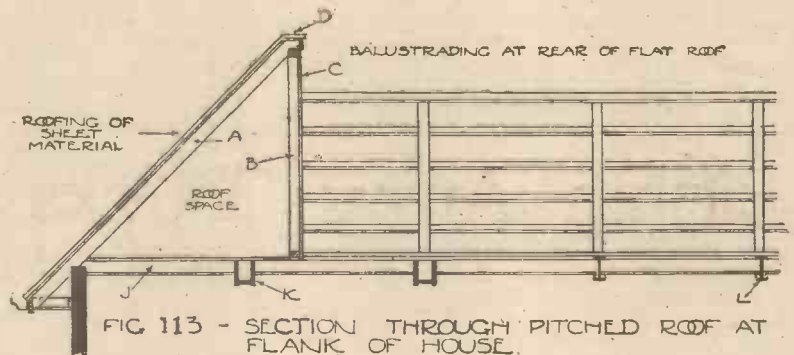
SECTION THROUGH PITCHED ROOF AT FLANK OF HOUSE.
